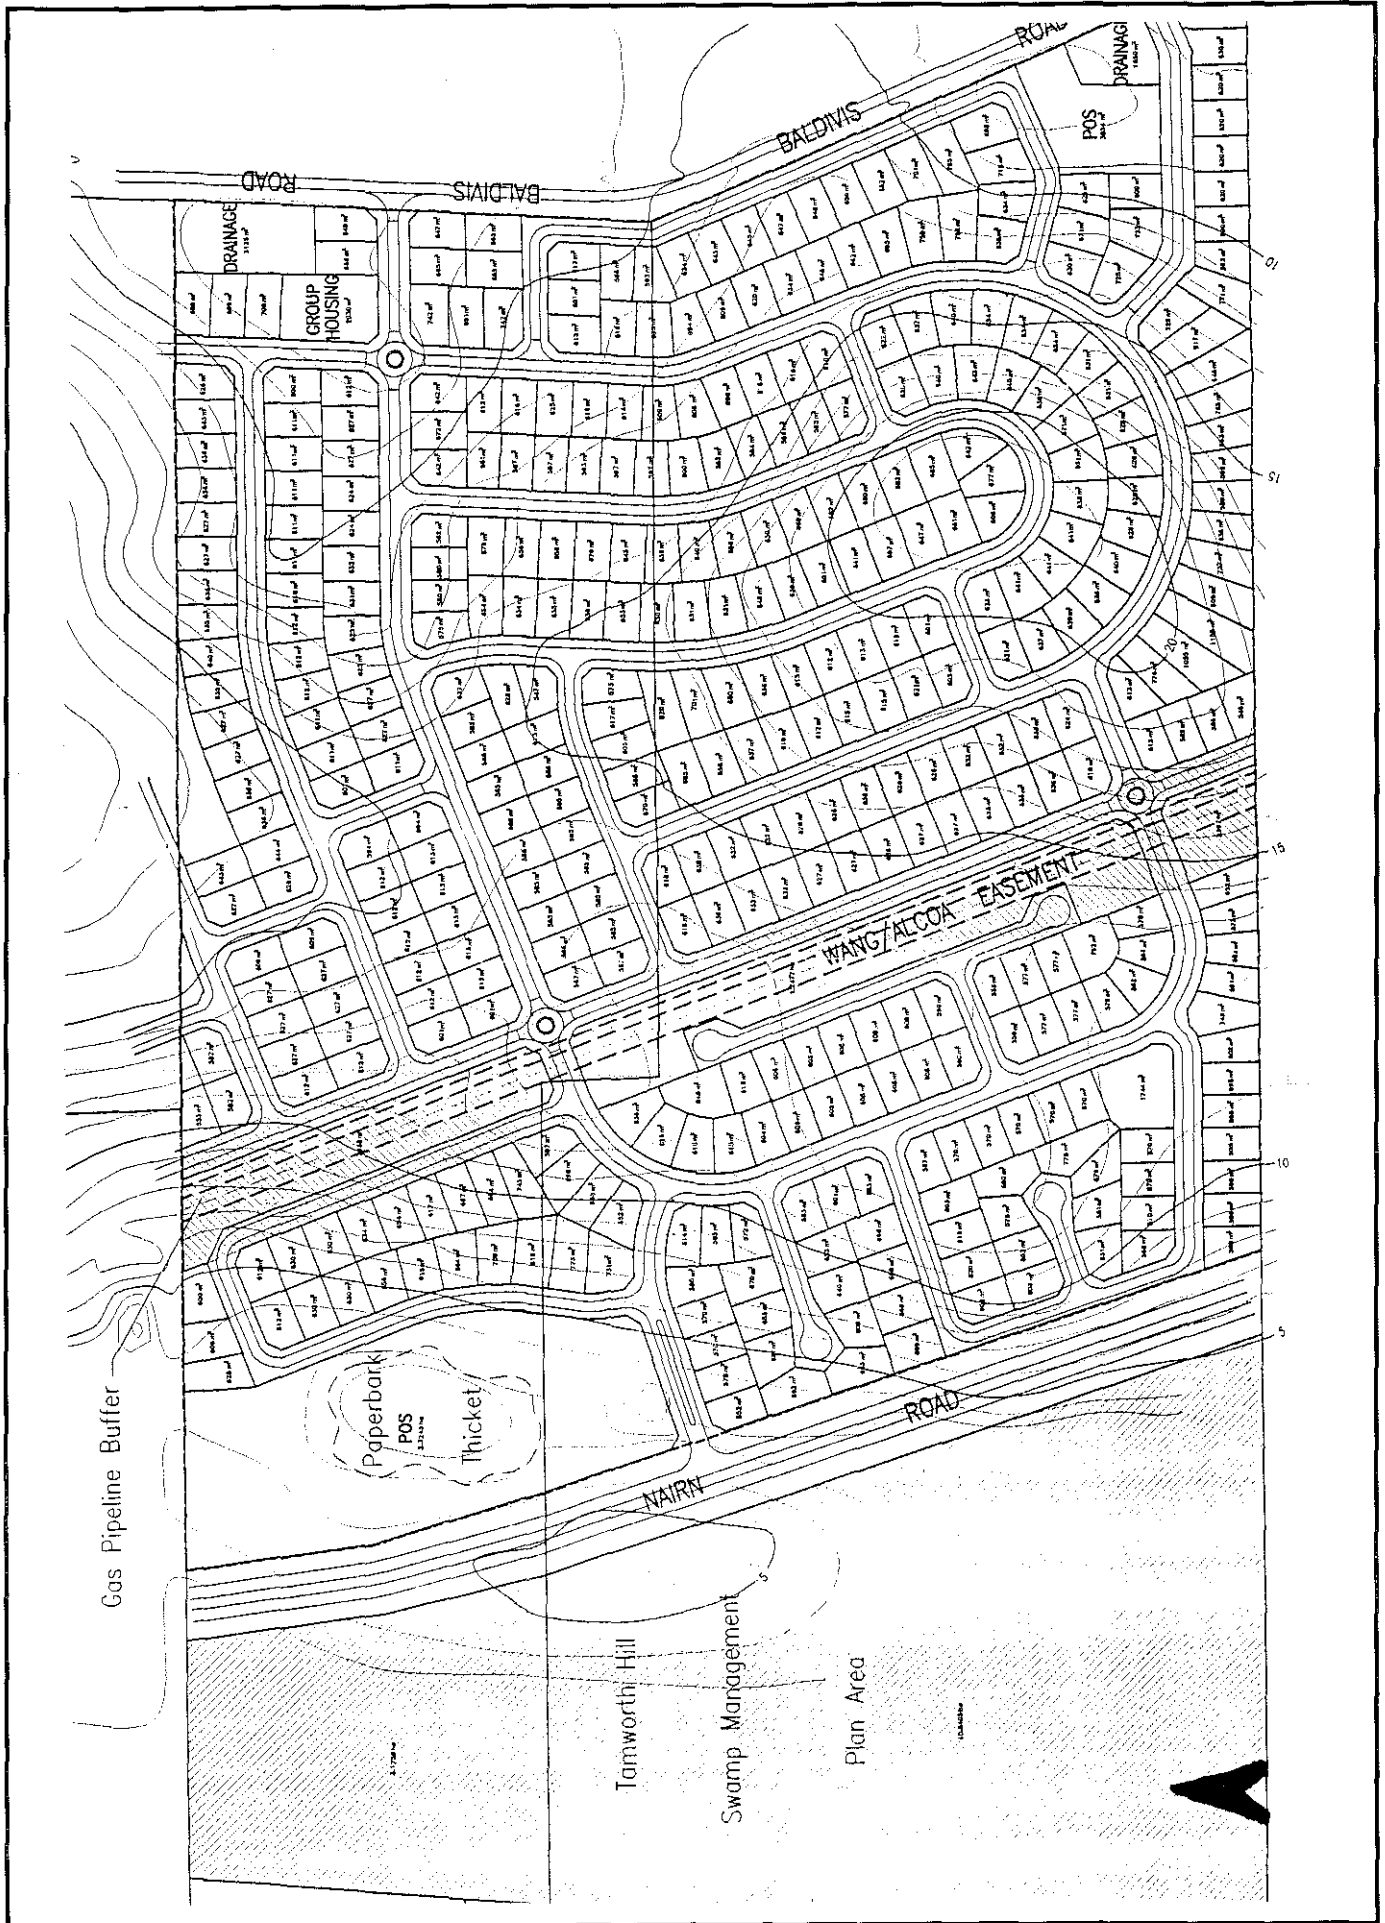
Plan of Subdivision (Source: Mitchell Goff & Assoc. 1998).
